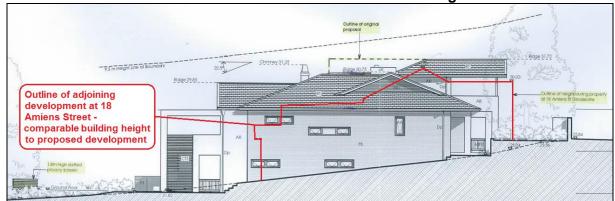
Diagram showing the proposed development and the outline of adjoining development to the east of the subject site at 18 Amiens Street, Gladesville. It is noted that the building height of the proposed development is considered to be comparable when utilizing the definitions for building height as contained within the Ryde LEP 2010 and Ryde DCP 2010 which is measured above existing ground level.
